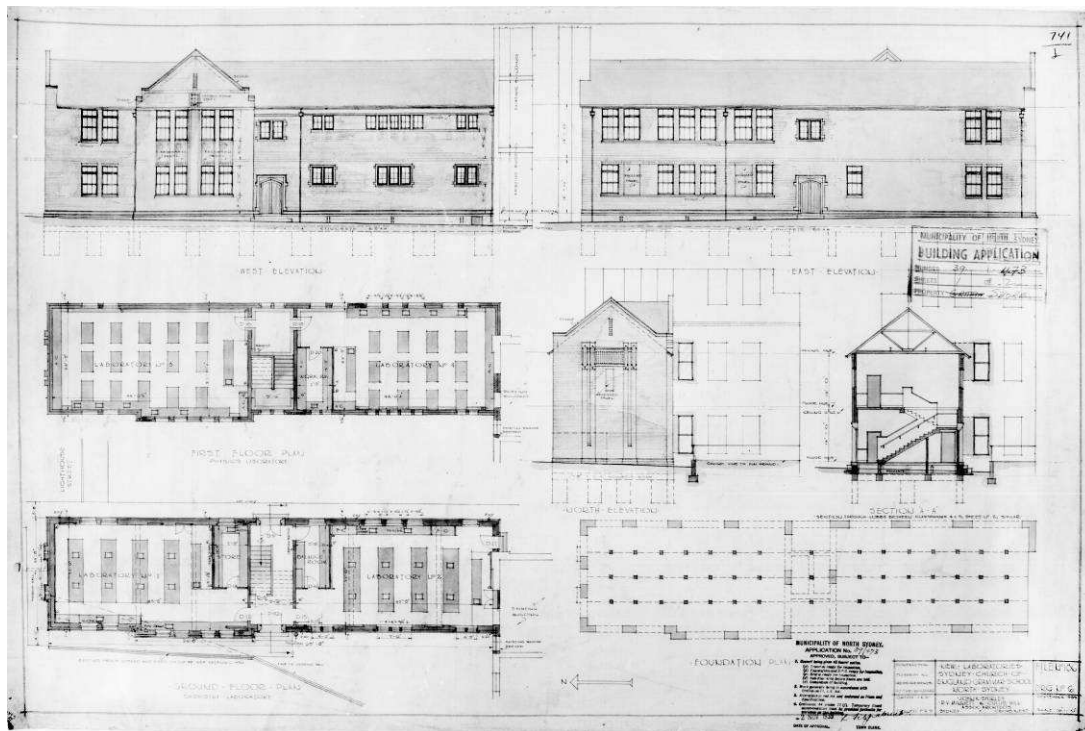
The elevations and floor plans of the 1940 Science Laboratory (North Wing).
